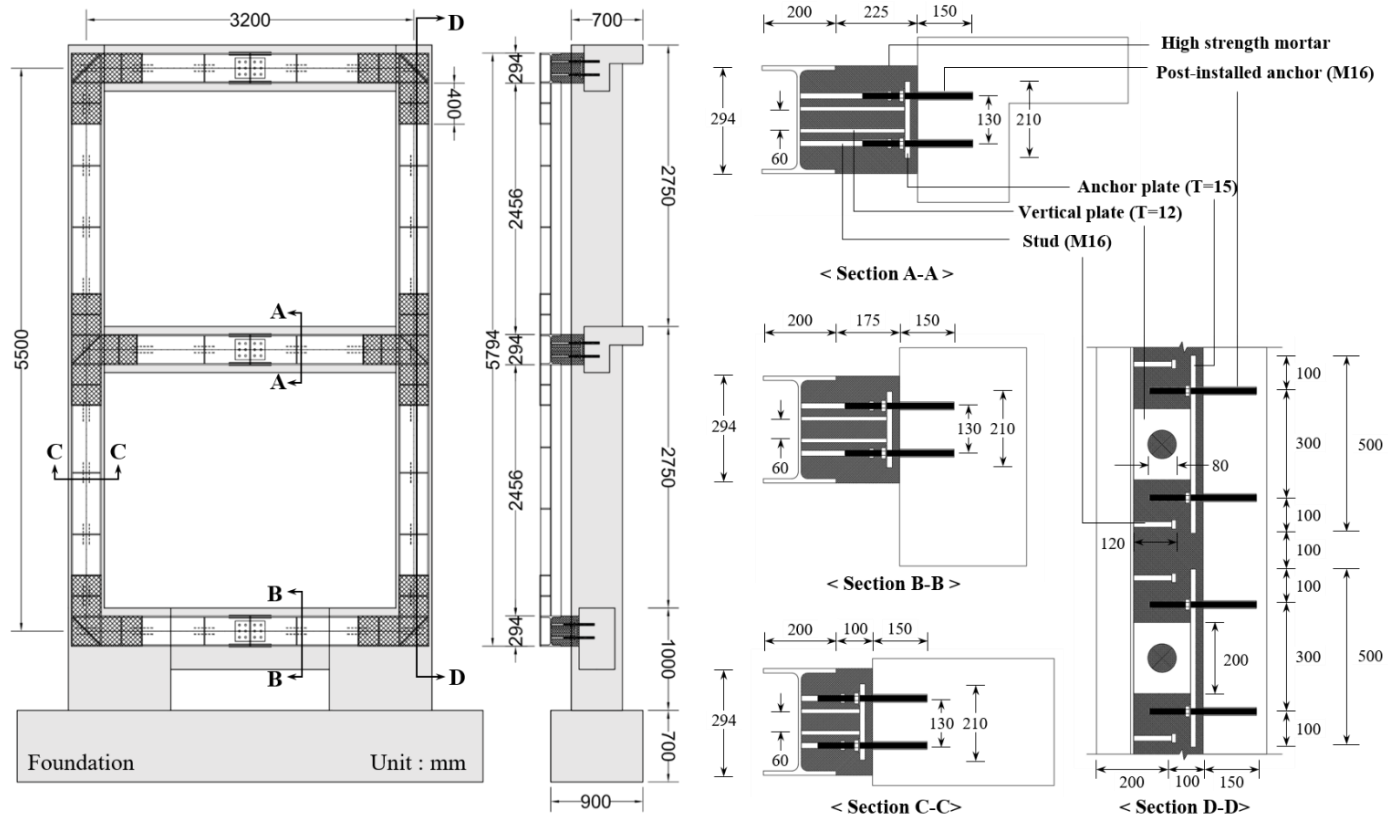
Dimensions and connection details of specimen retrofitted with external steel moment frame (EX-1)
